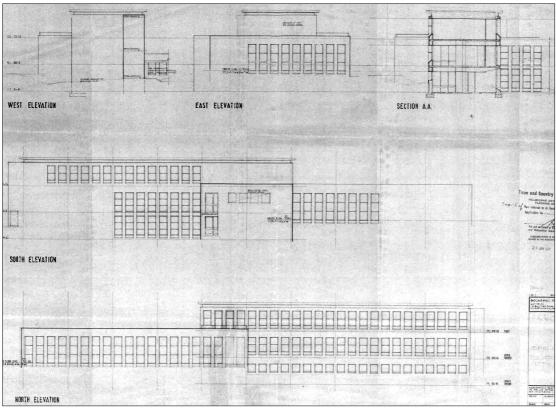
The Administration Building elevations, Mockridge Stahle & Mitchell, 1971. Source: ARRB.
